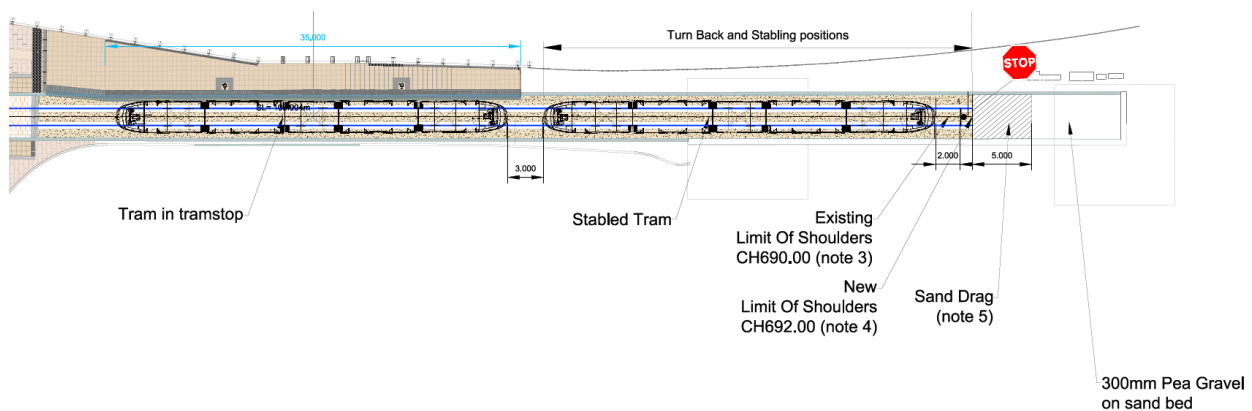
Plan view of terminal tram stop at Wolverhampton Station
